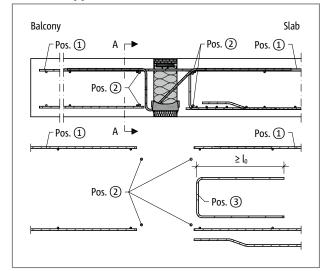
Schöck Isokorb® T type K: On-site reinforcement with indirect sup-
